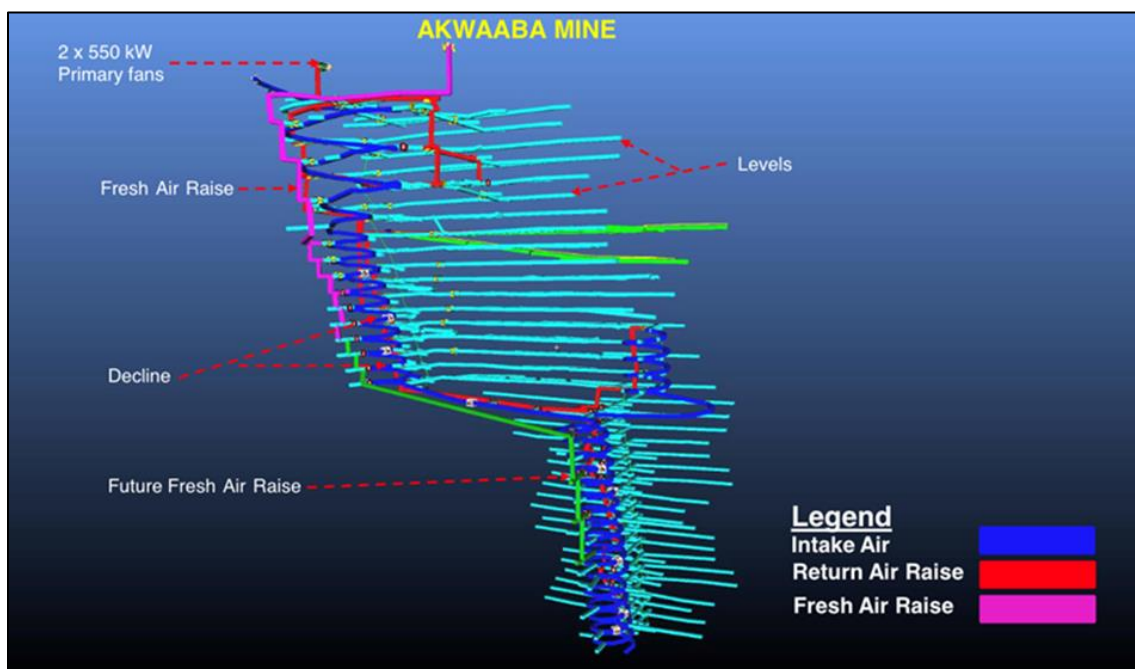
Isometric View of the Akwaaba Underground Ventilation Plan
